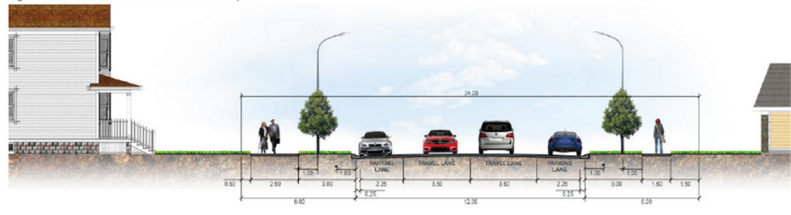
24.0m Undivided Collector Roadway Cross-Section
